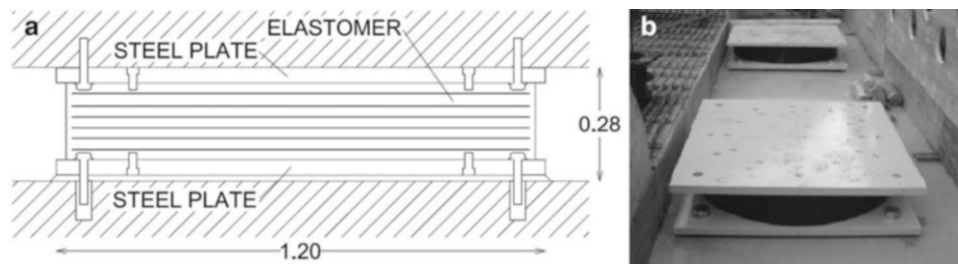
Elastomeric bearings of Dogna bridge: (a) vertical cross-section; (b) detail. Length in meters
